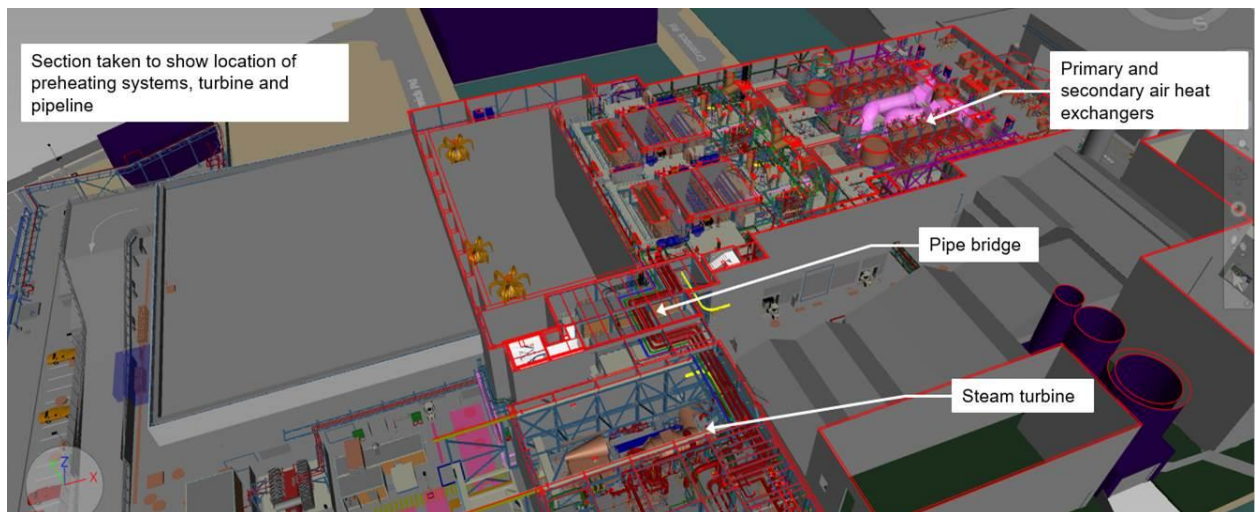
3D Model Section View of Consented Development with external pipework and pipe supports (Note – Proposed Project external pipework is coloured blue)
